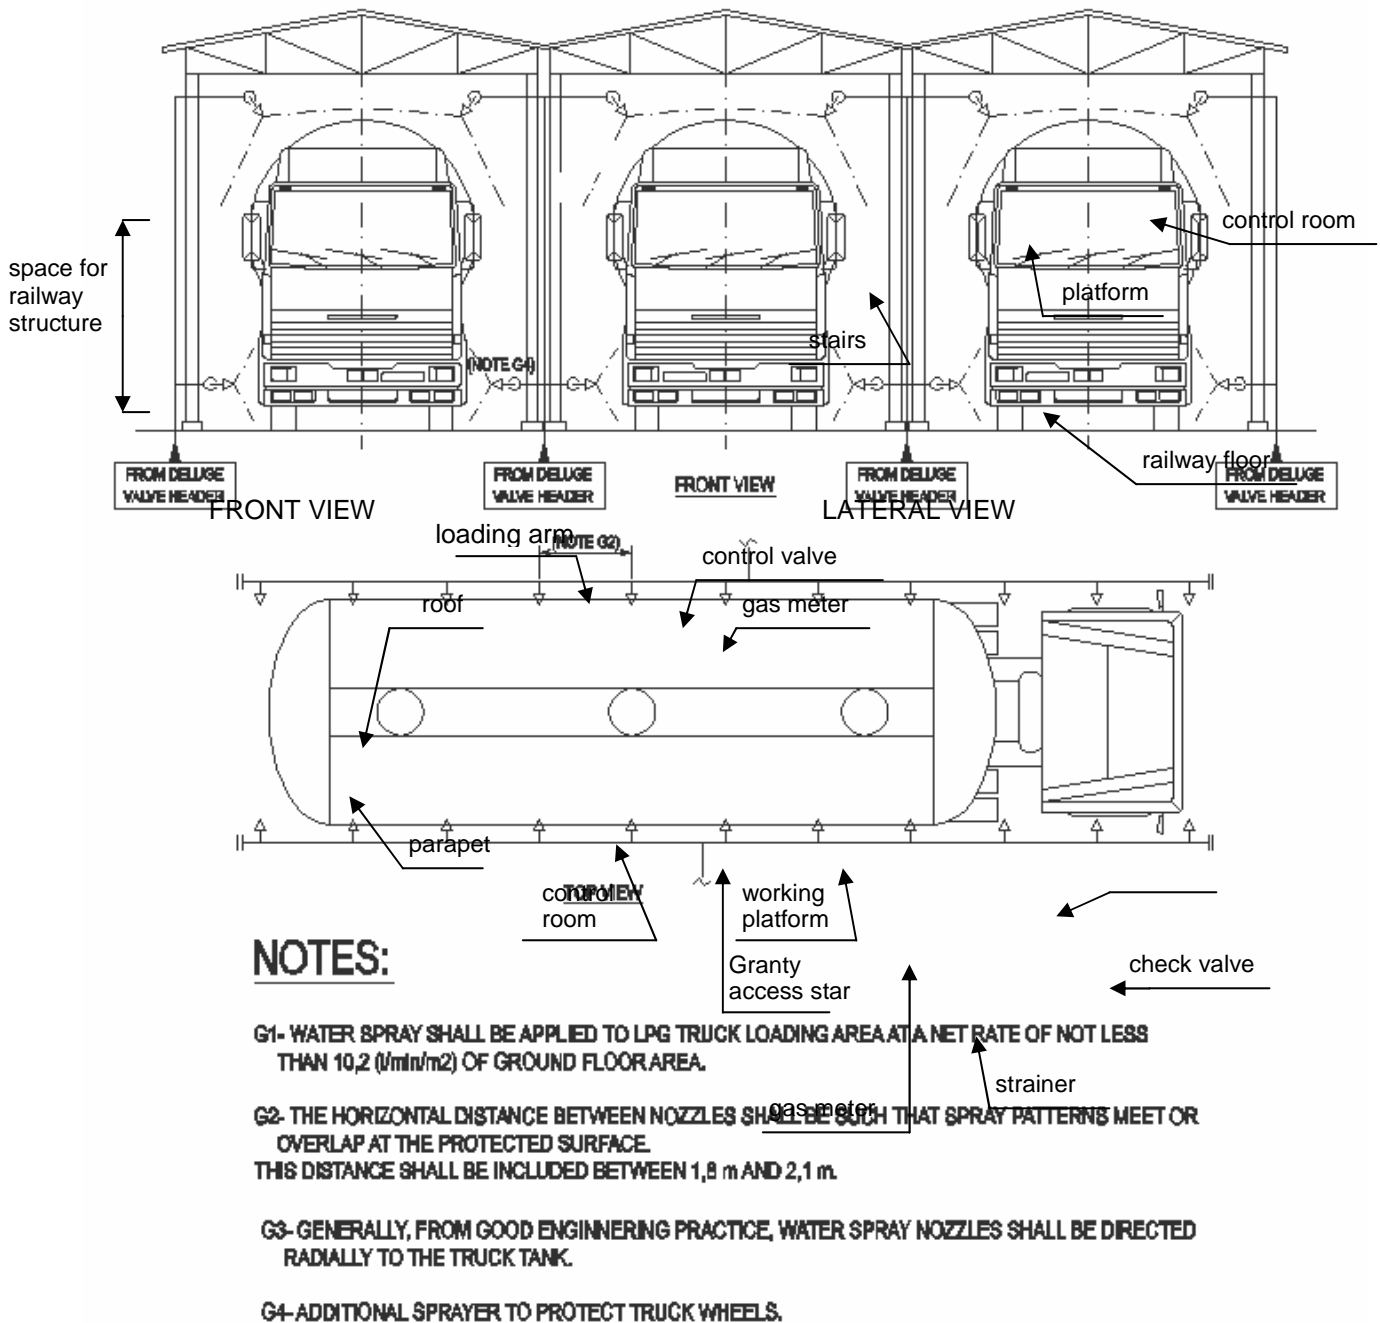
Water spray nozzle typical arrangement for lpg truck loading areas
